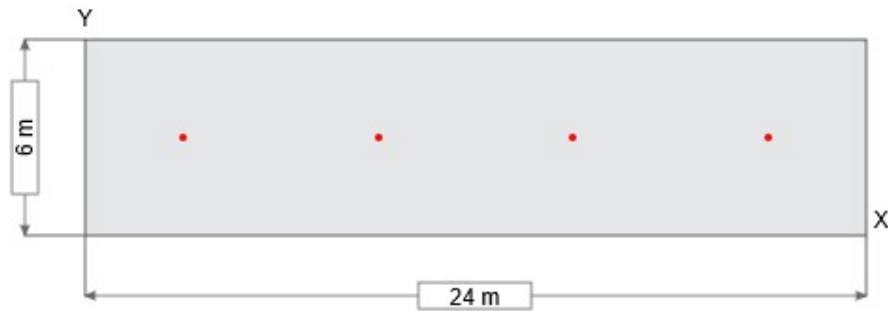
Floor Plan View of Entrance/Sitting Area
